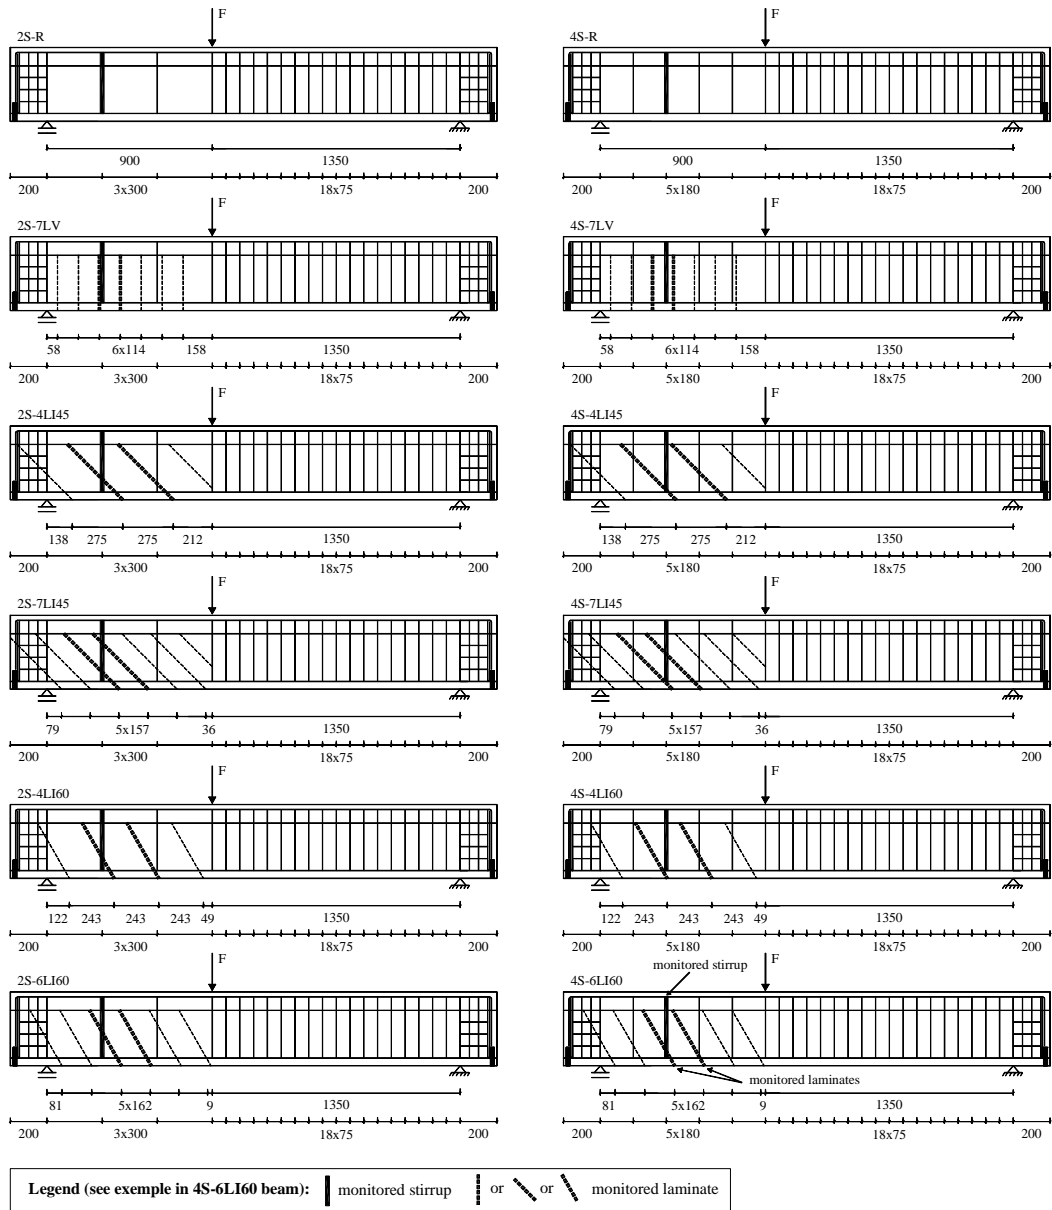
Localization of the steel stirrups (continuous line) and CFRP laminates (dashed line) in the tested beams
